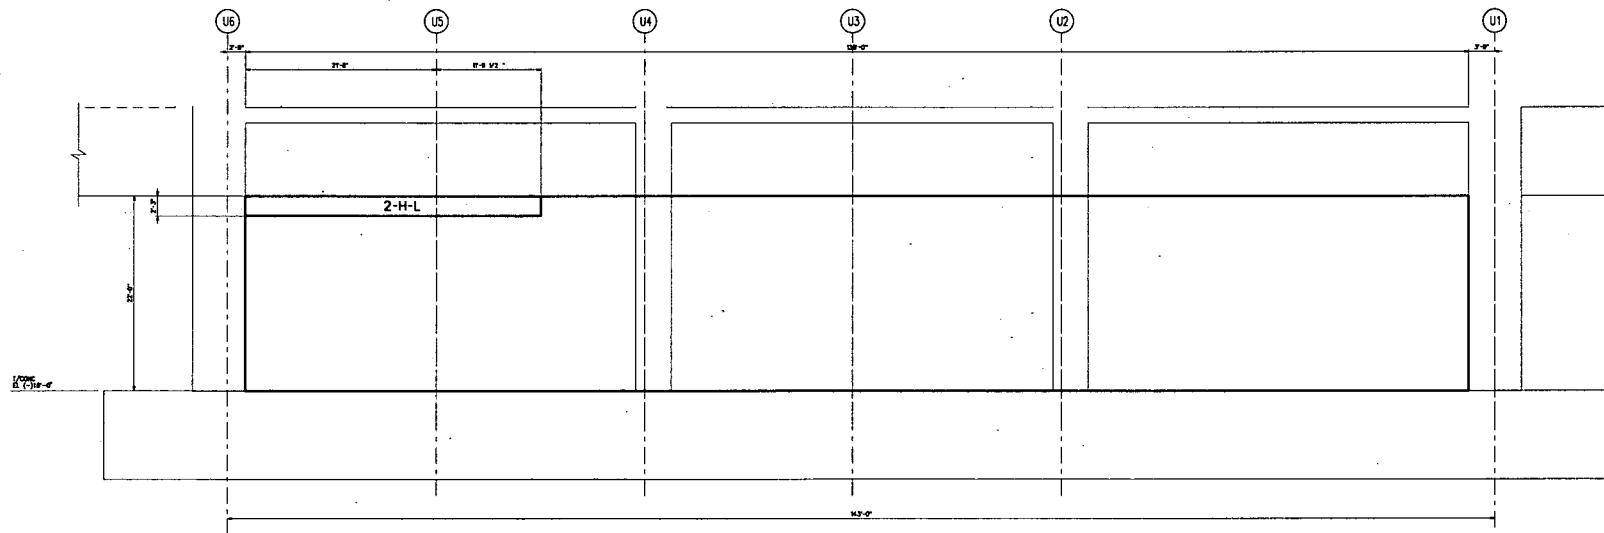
H.6-62: PUMPHOUSE SOUTH WALL LOOKING SOUTH
